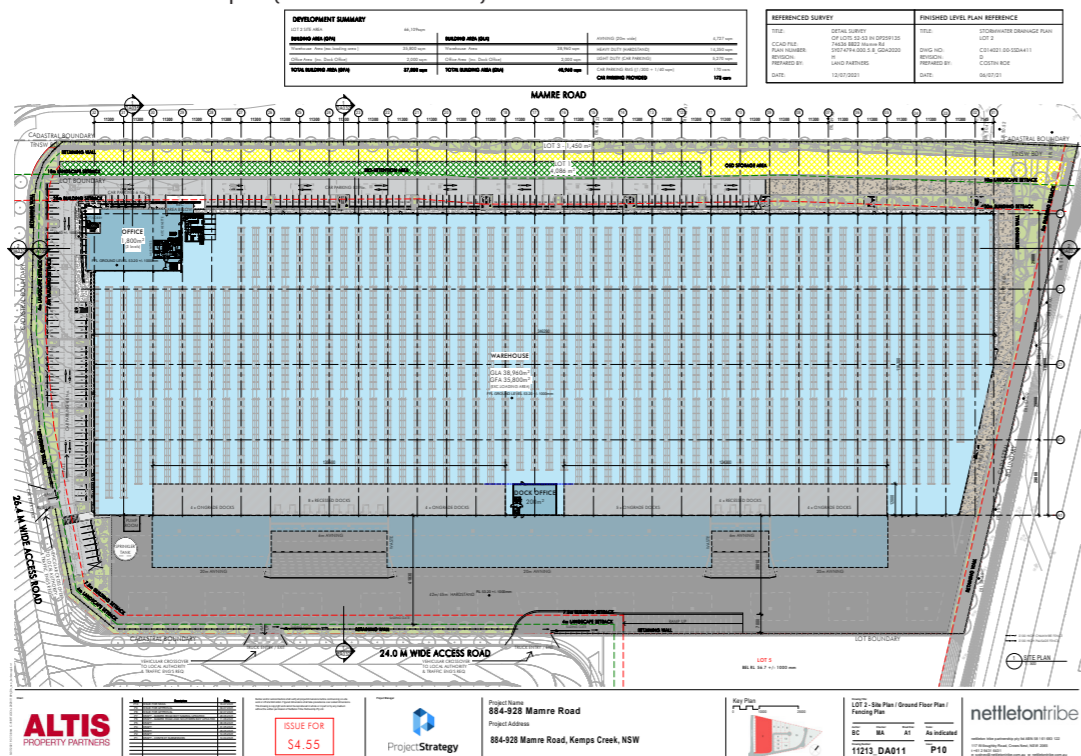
884-928 Mamre Road - Ground Floor Plan LOT 2 (Source: Nettletontribe)
